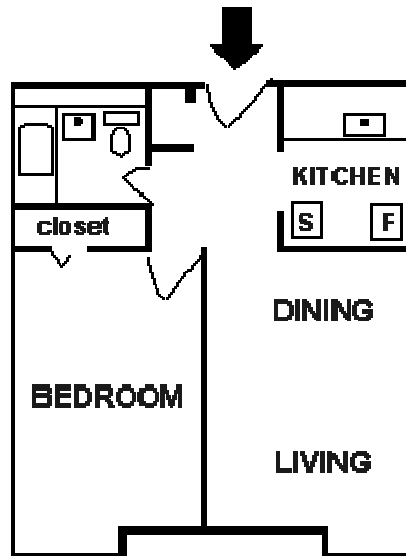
Floor plan of one-bedroom apartment at YU ⁸⁵
